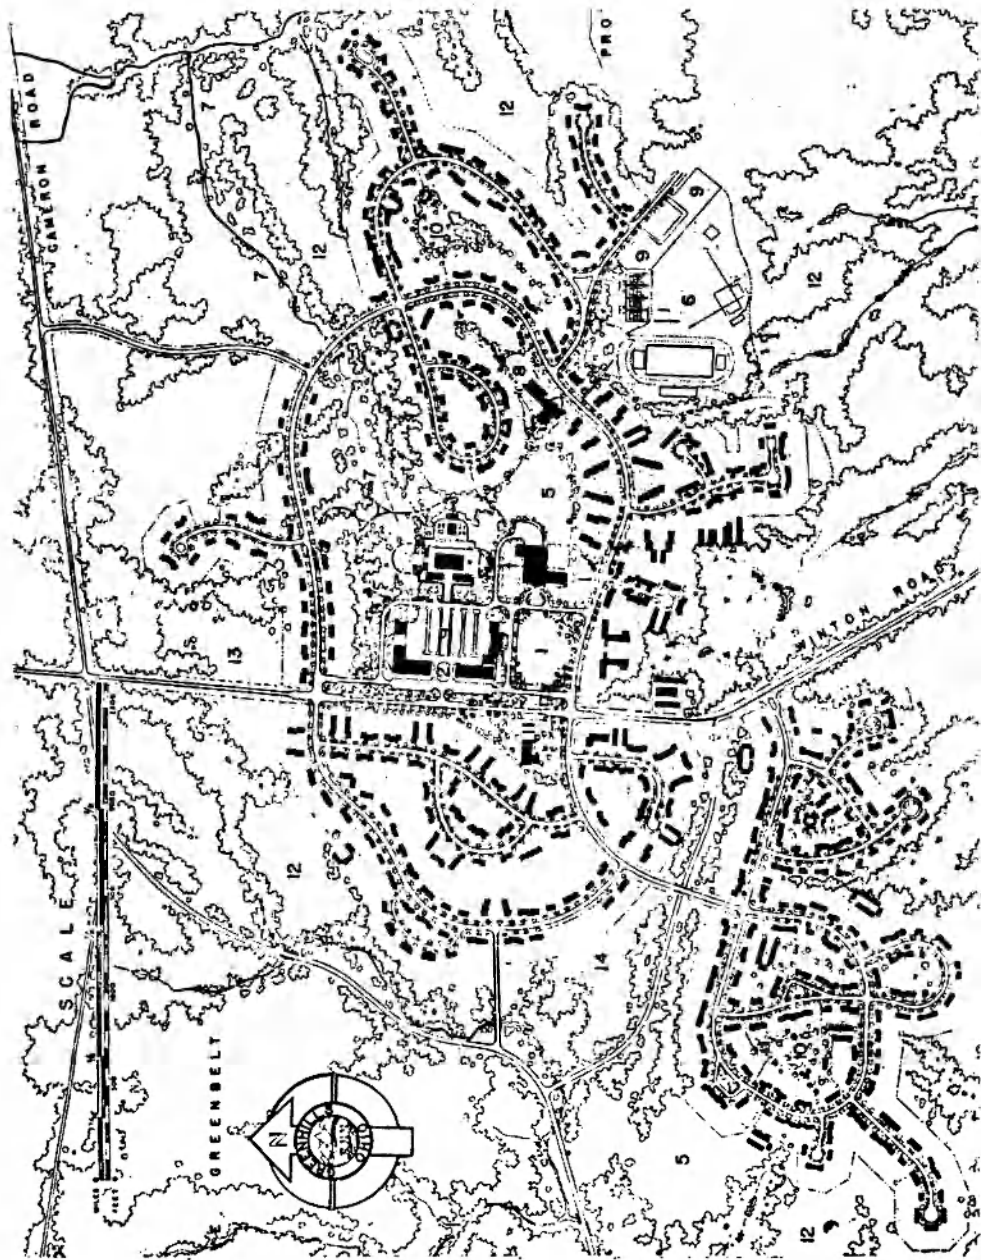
Greenhills, Ohio. Town Plan showing 1/ Common; 2/ Shopping Center
